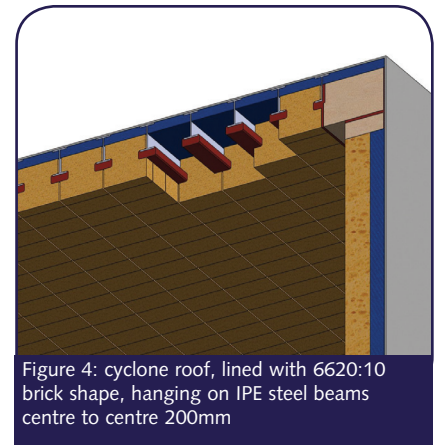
cyclone roof, lined with 6620:10 brick shape, hanging on IPE steel beams centre to centre 200mm
